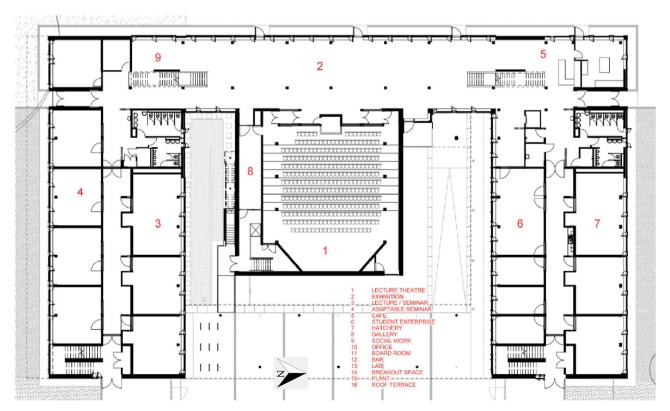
The ground floor of The Enterprise Centre by Architype [31].
